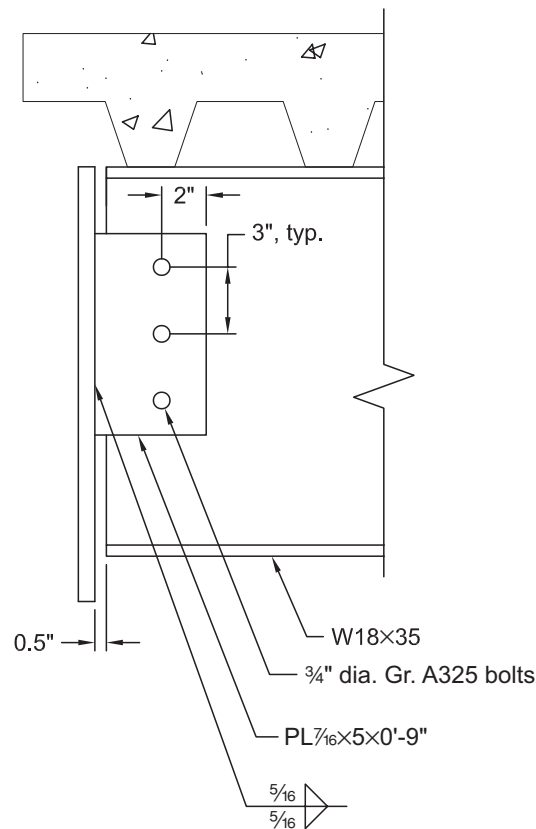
Shear tab connection used in CB-SP NIST composite beam test.
